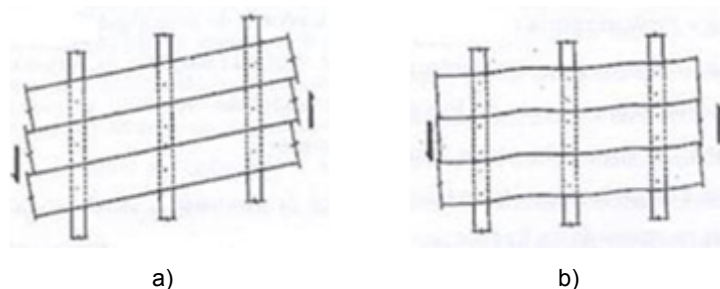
Possible deformation of the timber floors (Carvalho and Oliveira, 1997); a) Timber boards and floor beams connected by one nail; b) Timber boards and floor beams connected by two nails.
